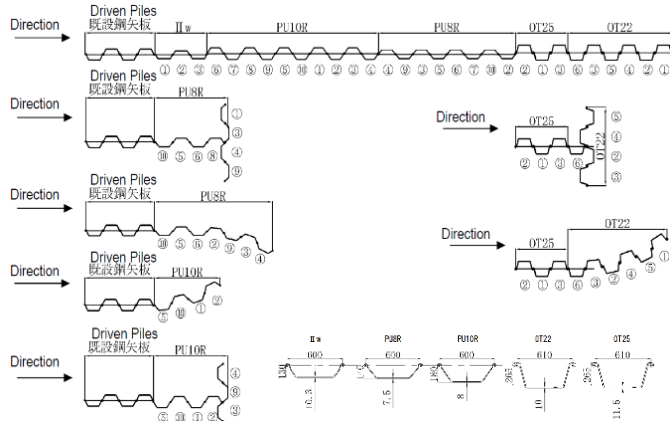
Sheet Pile Driving Layout for Press-in Verification Test
